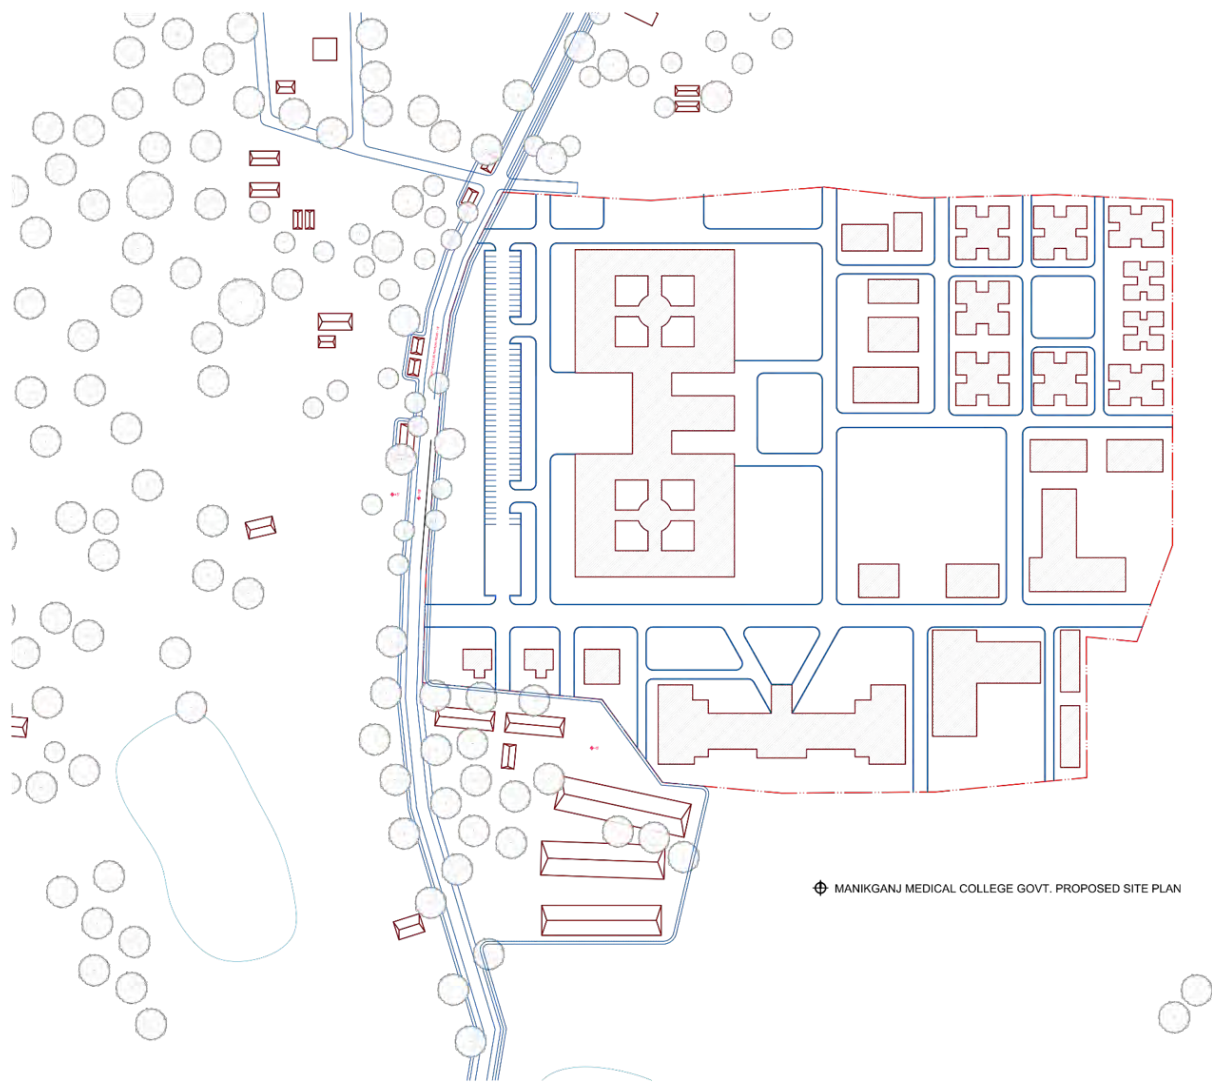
Existing Masterplan (Source: Project architect, prepared by author)
